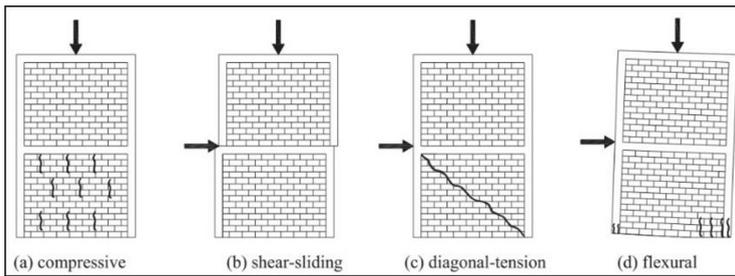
failure modes of masonry wall under vertical and horizontal loads (based on [1])
